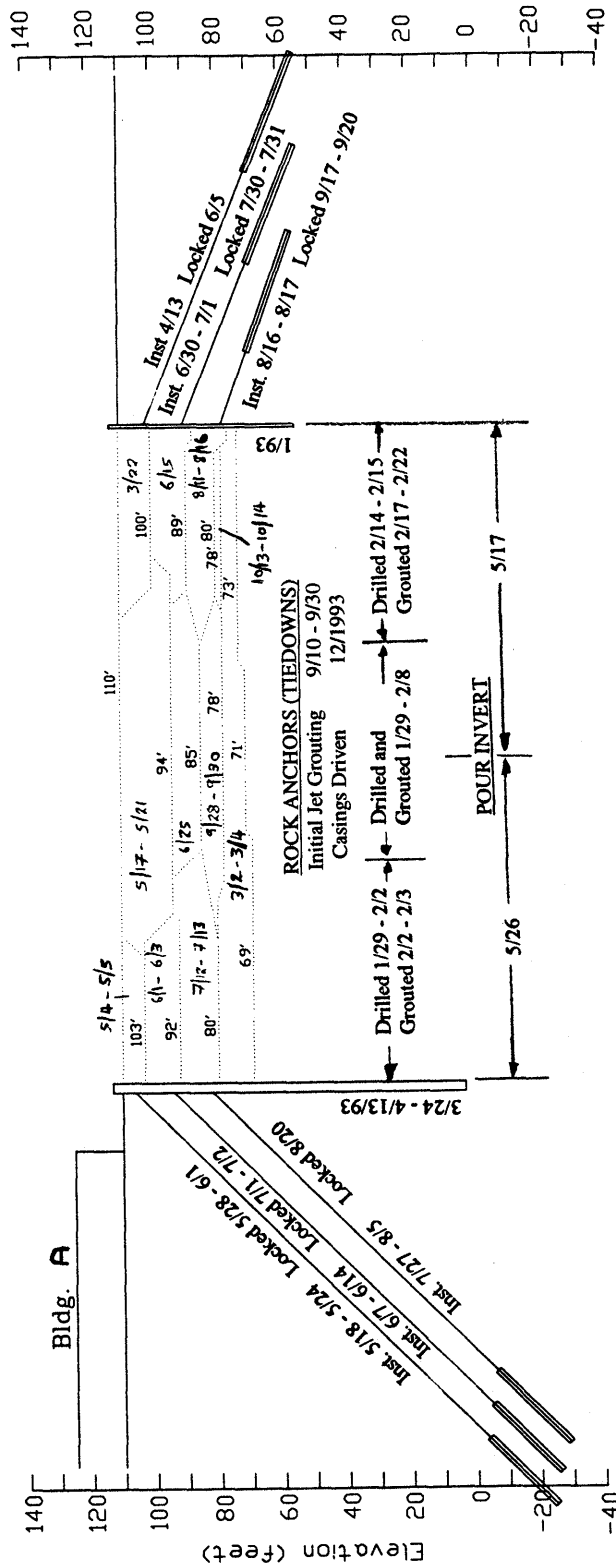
Graphical Summary of Construction Activities and Lift Excavations at ISS-4.
